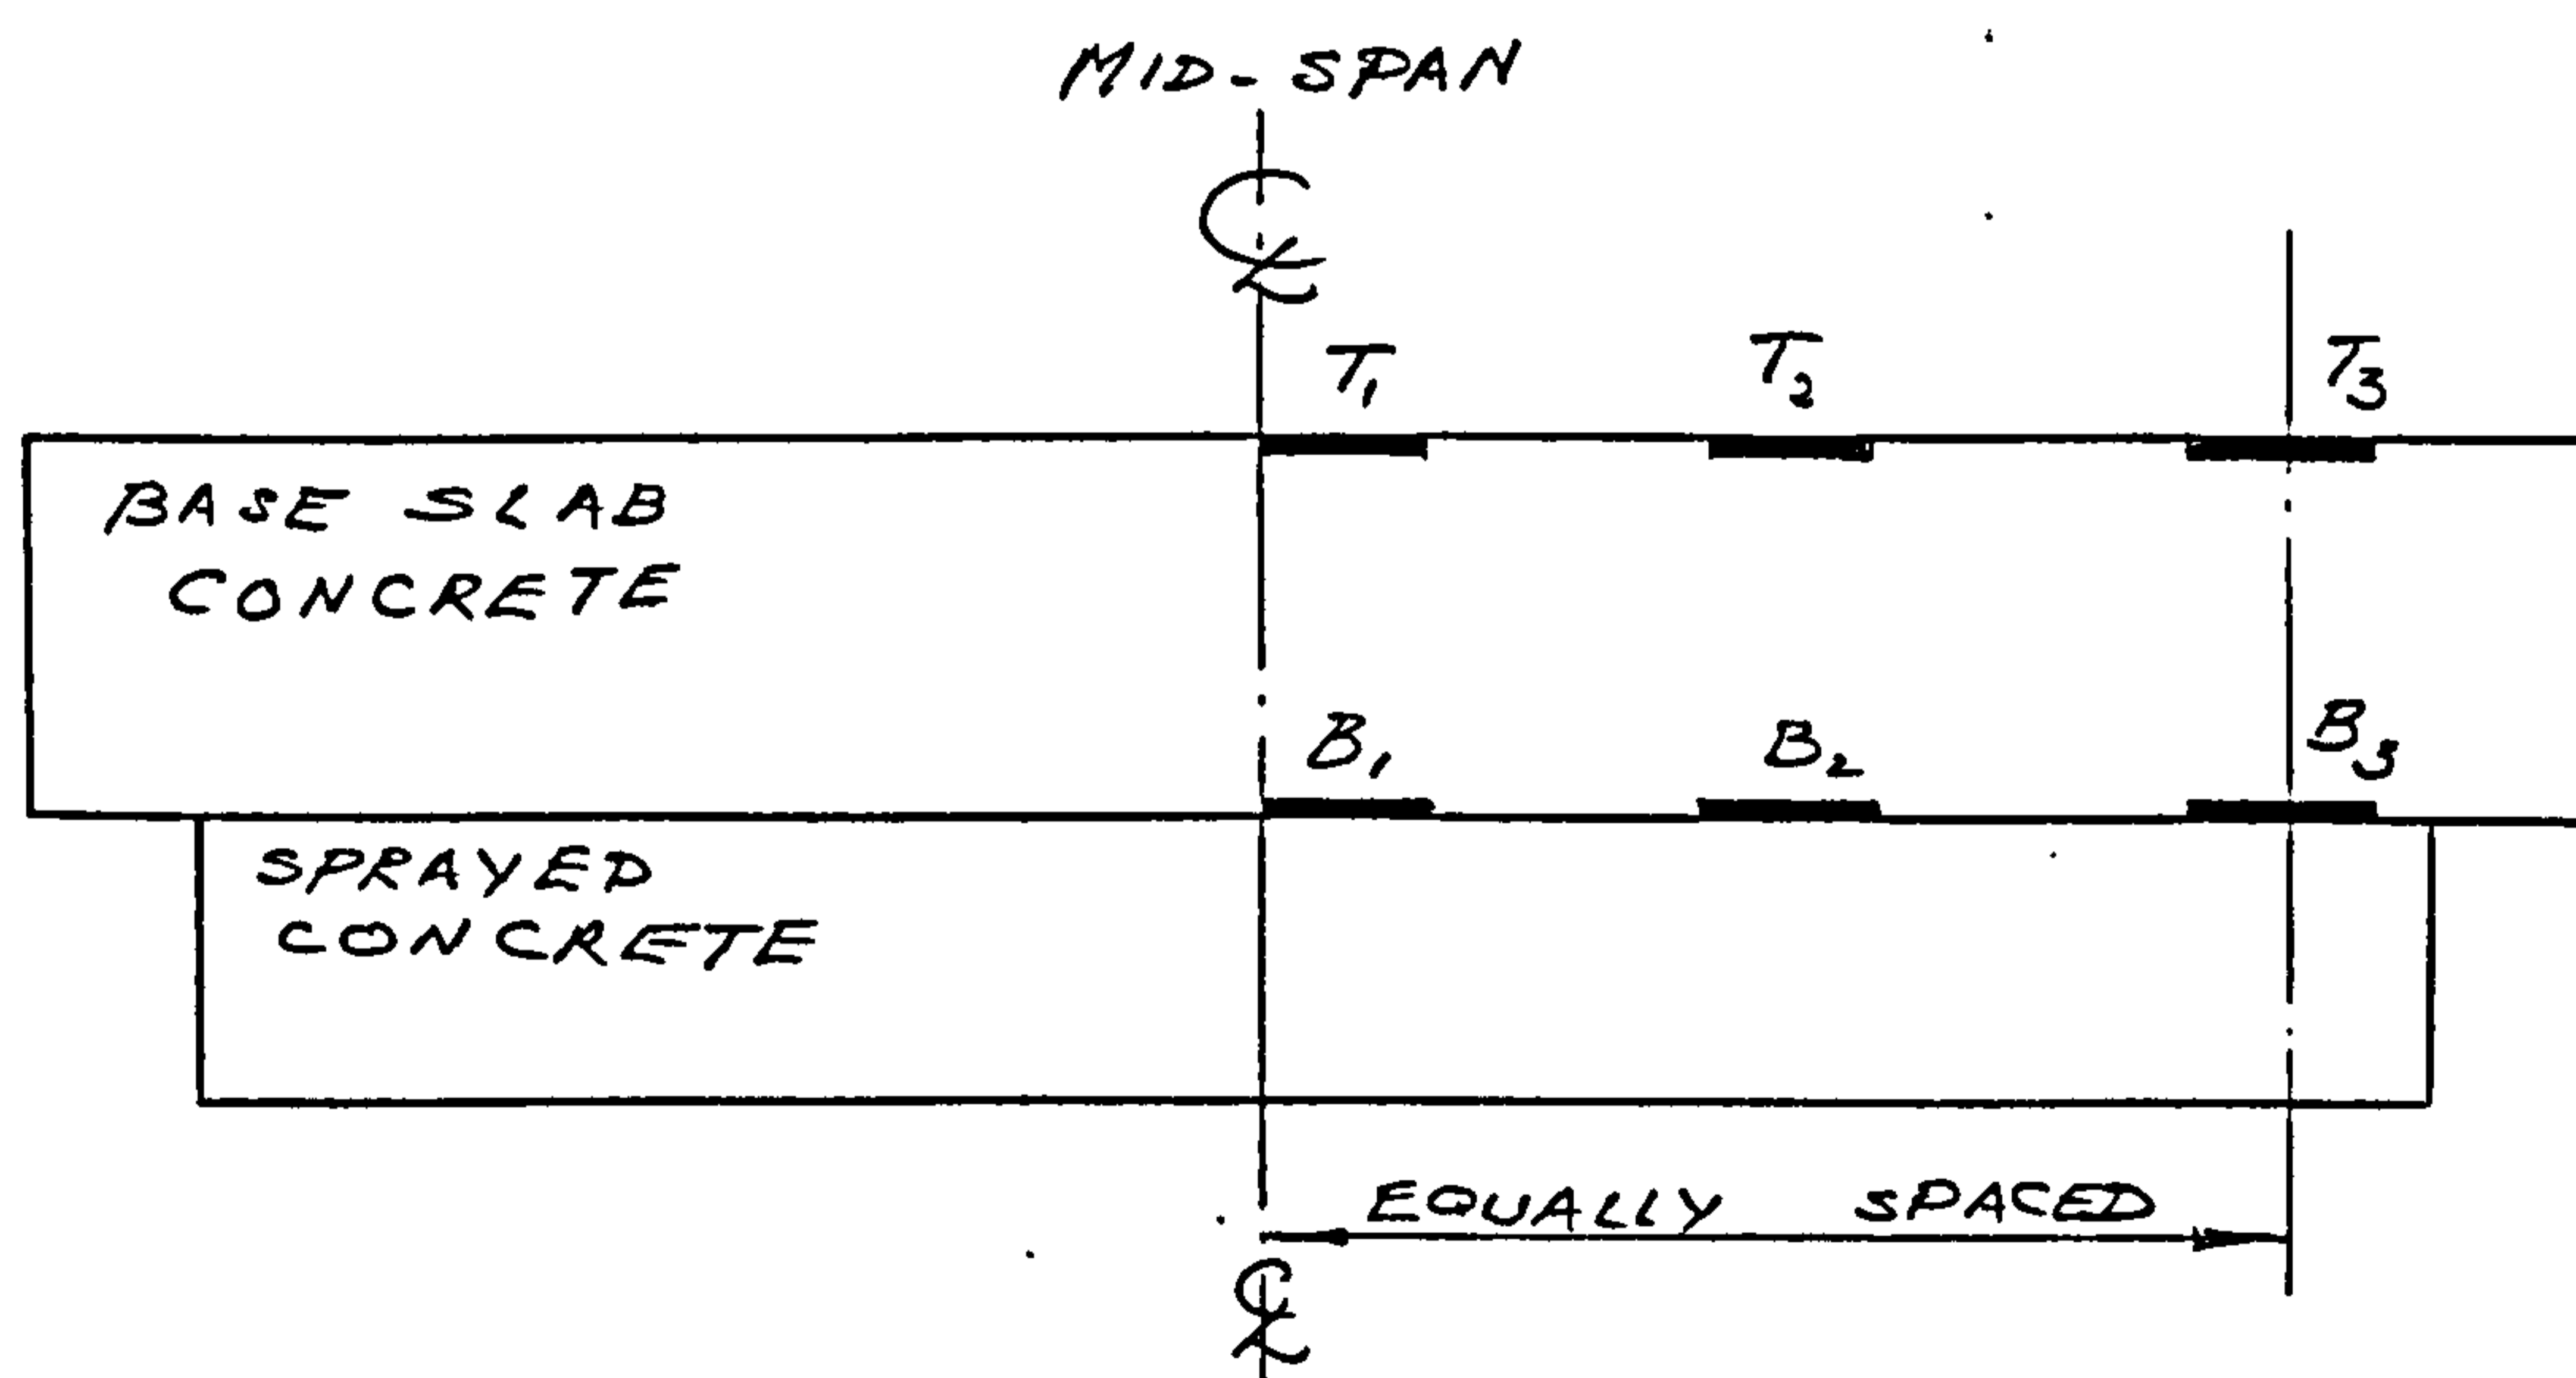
Positions of the strain gauges on the base concrete slab.
